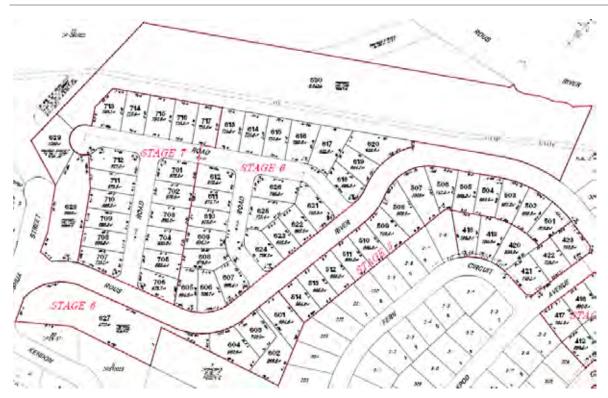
excerpt of amended subdivision plan 19291 B Sheet 1 Revision A (31 May 2013)
